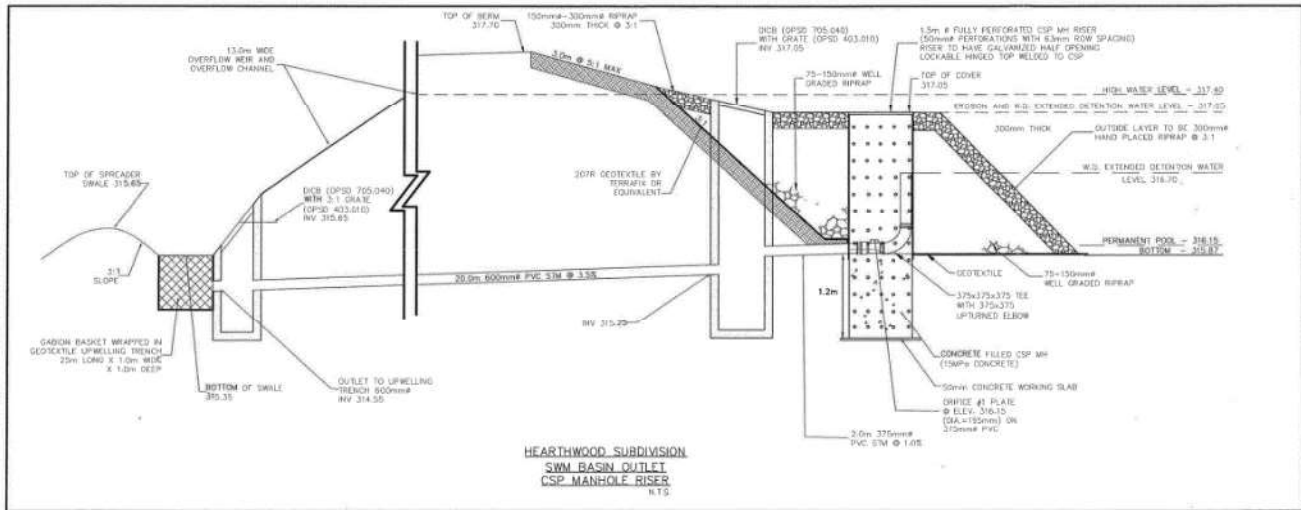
Hearthwood Subdivision SWM Basin Outlet Configuration
